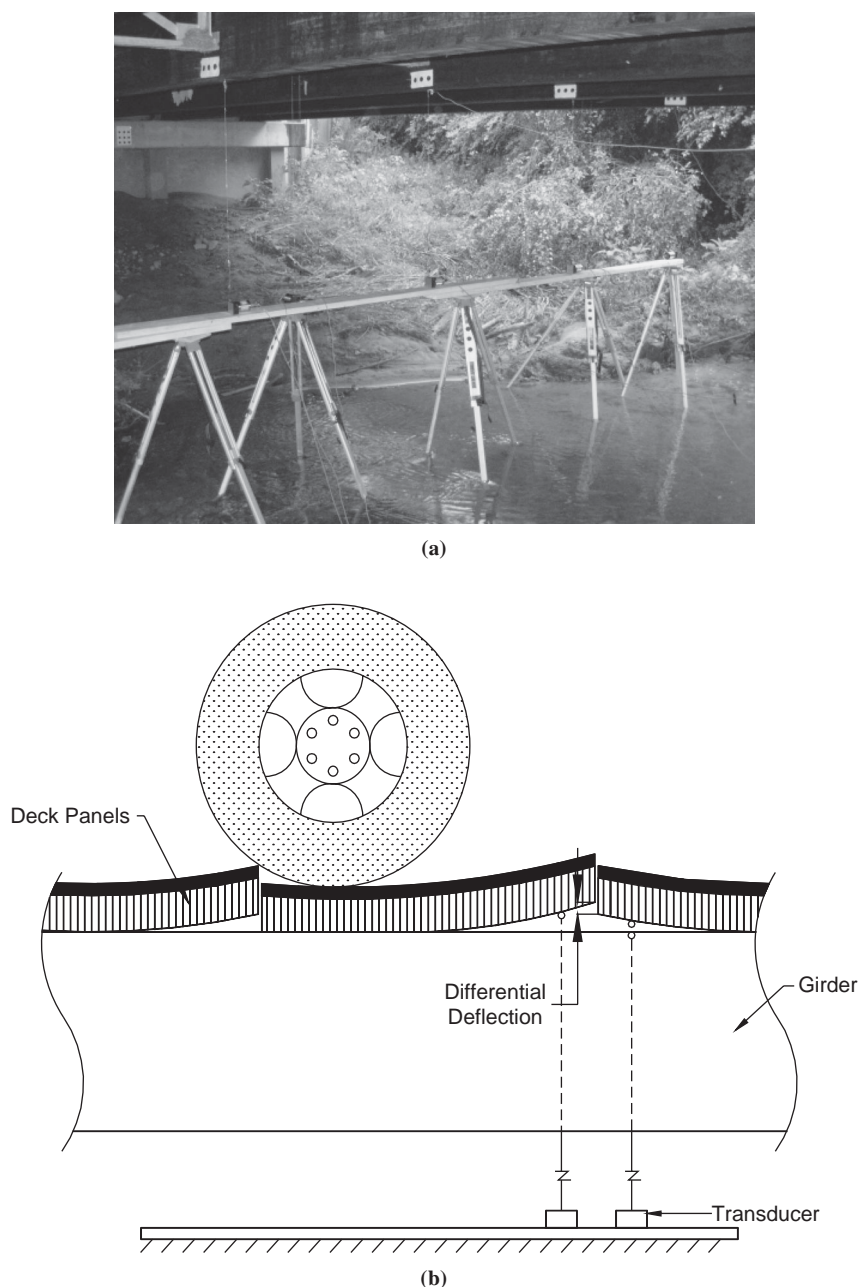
(a) Typical instrumentation setup for deflection measurement and (b) instrumentation setup for determination of differential panel deflection.
